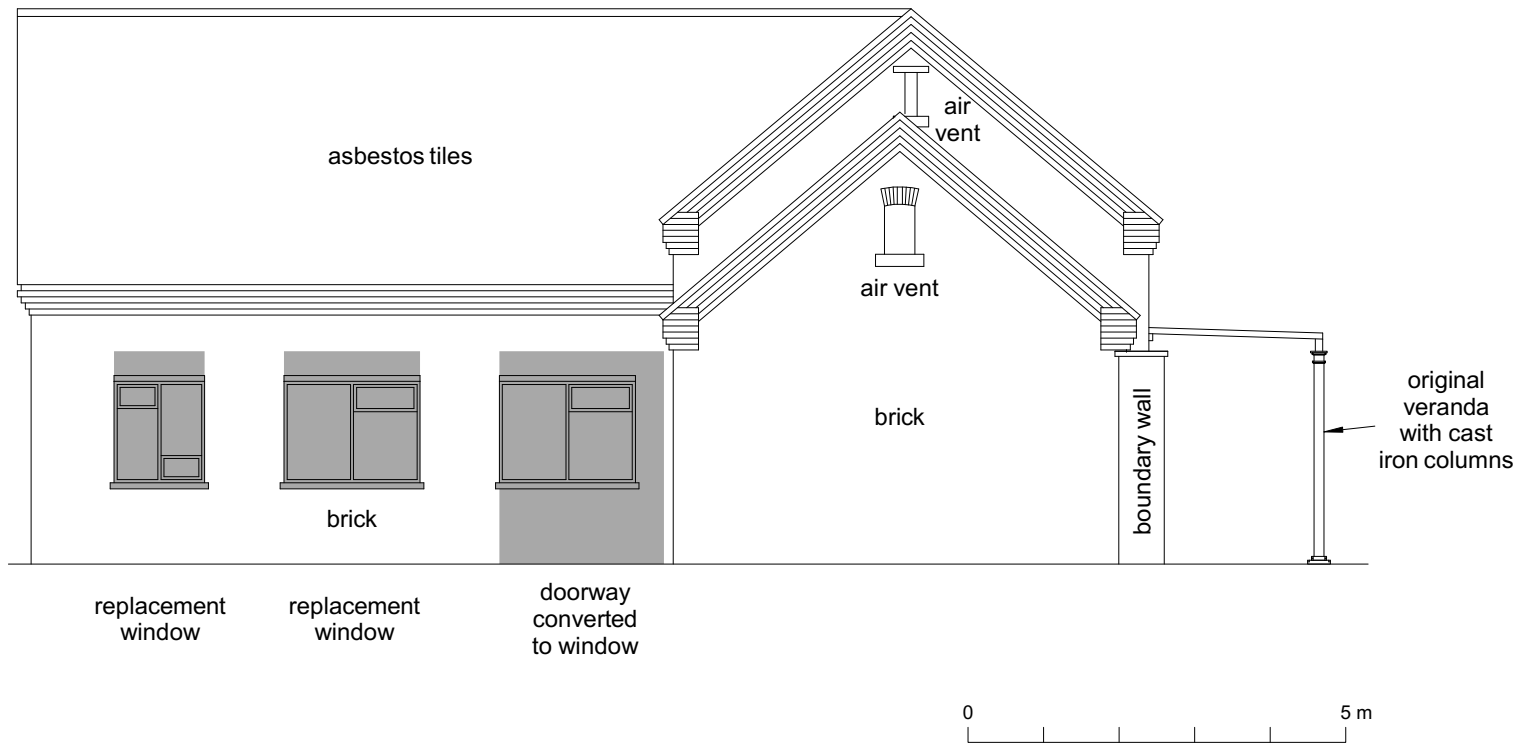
MEE 03: west elevation of the former Meeanee Barracks Guard House, with alterations shaded grey.
